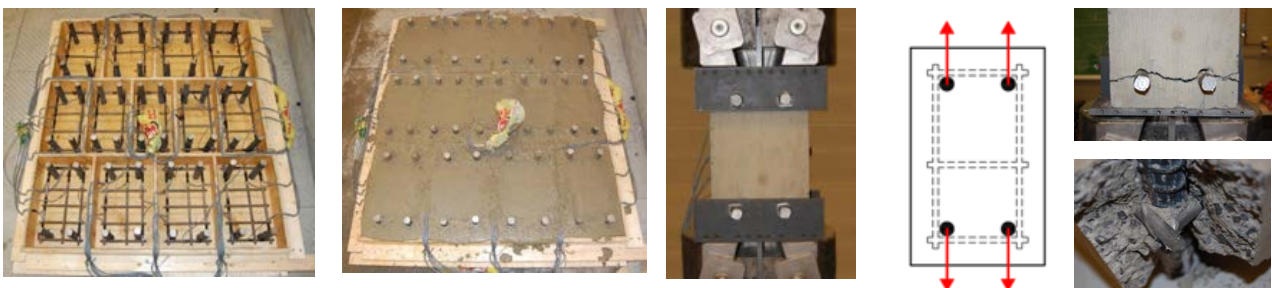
Direct shear tests on grids embedded in concrete prisms and pulled parallel to the longitudinal grid direction and the failure of grid welds
